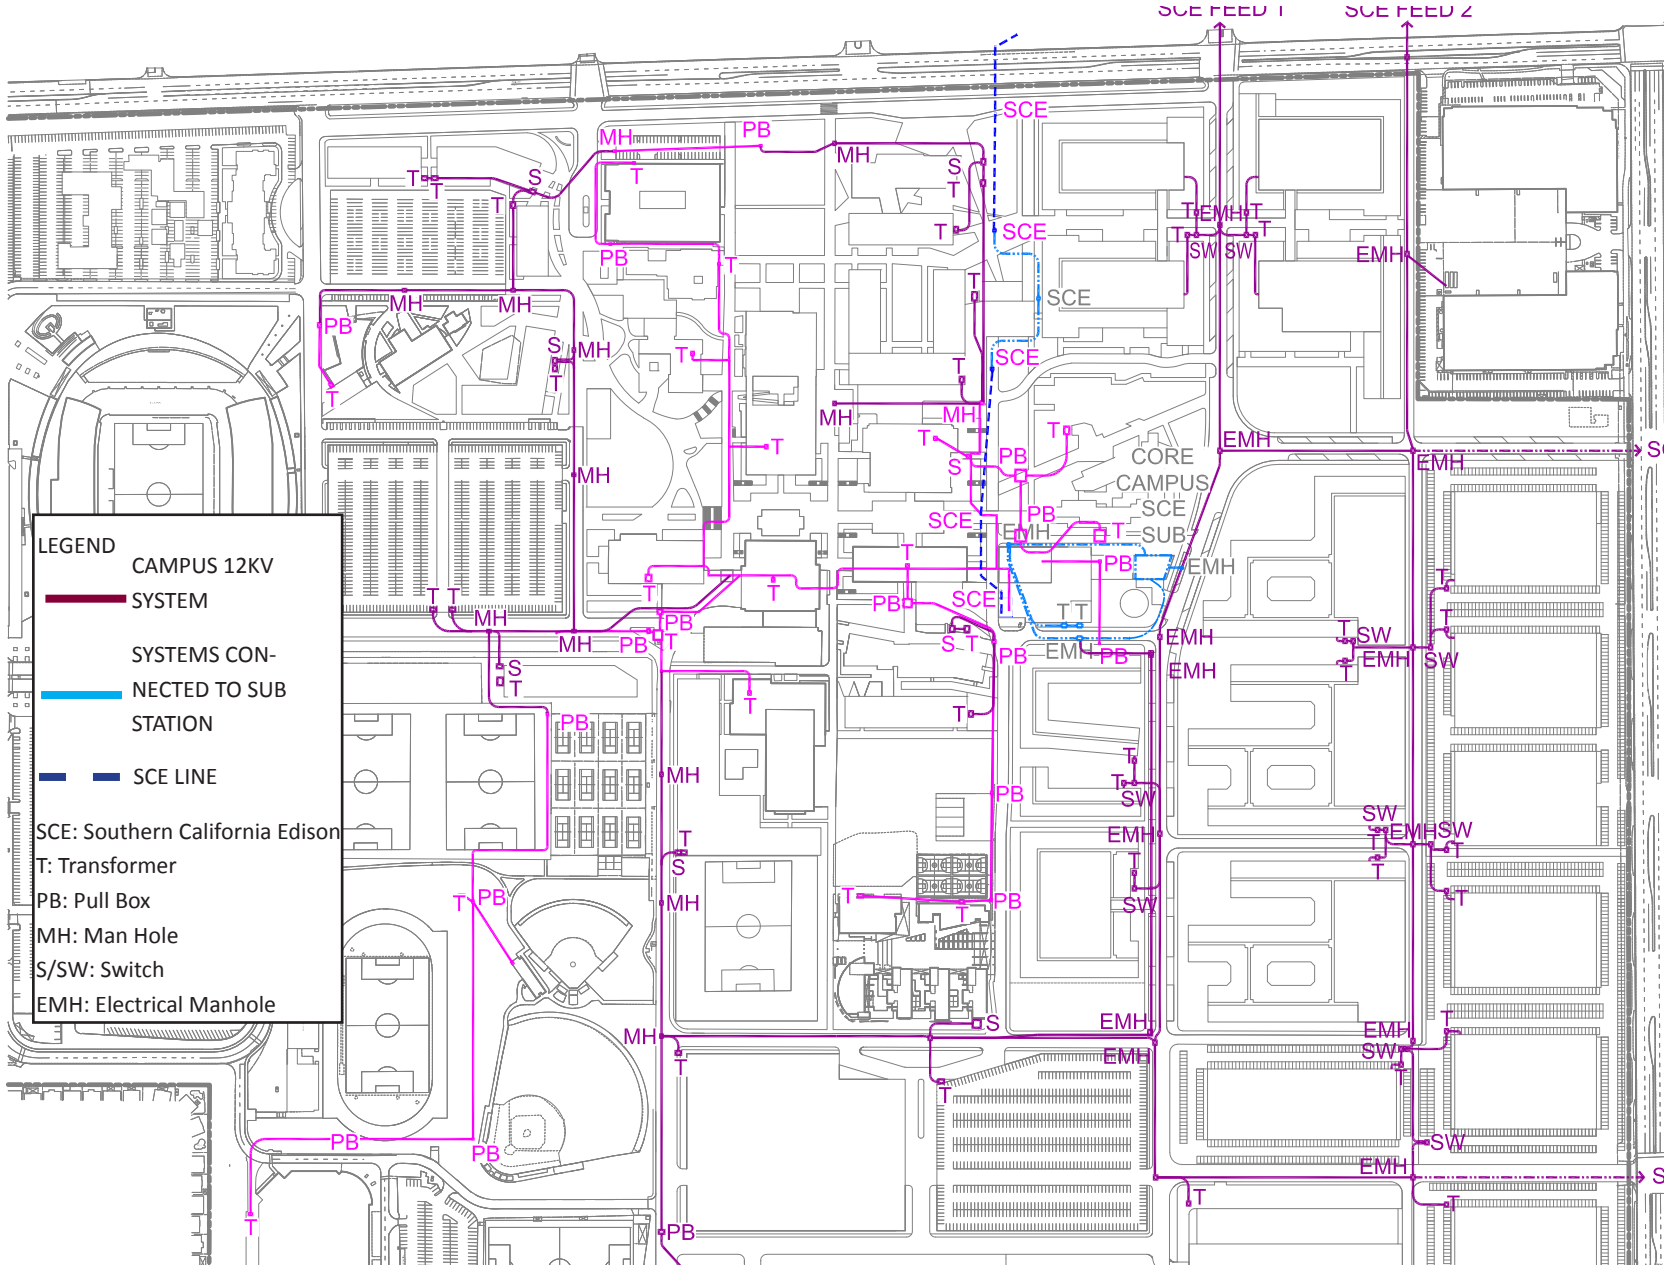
ELECTRIC POWER SITE DISTRIBUTION PLAN
